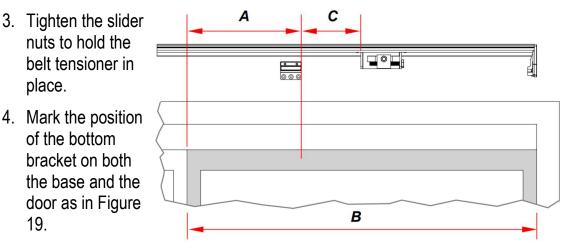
Left-opening sliding door: belt tensioner and bottom bracket. The right side is shown with sliding door closed.
